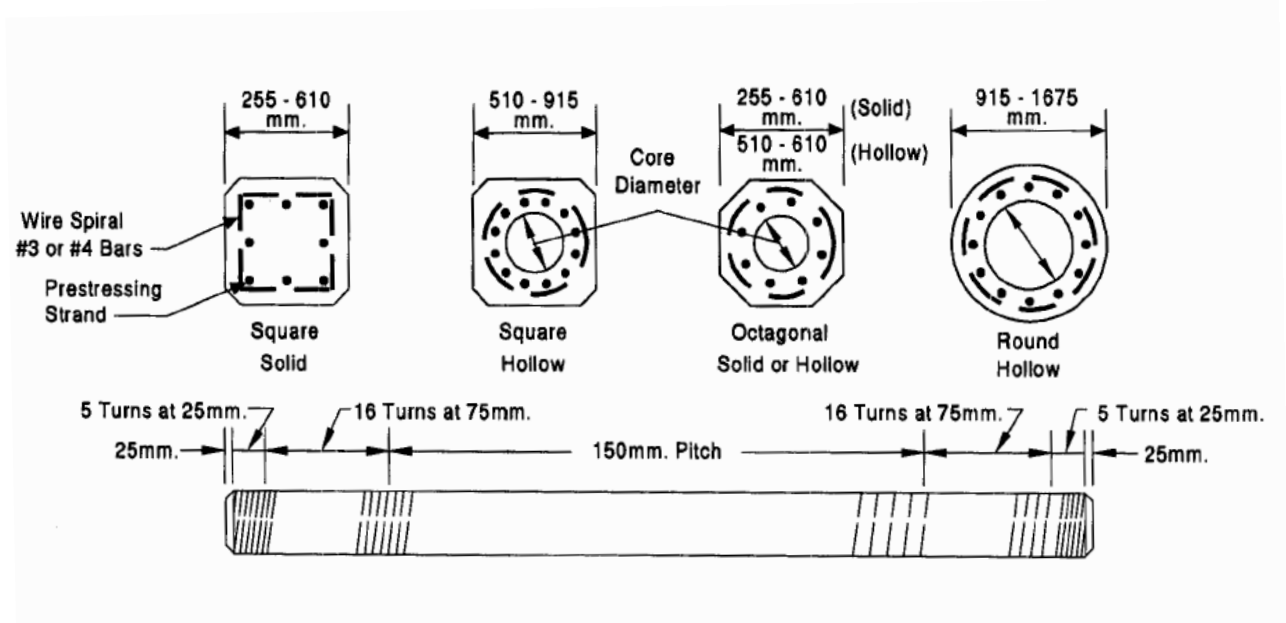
Typical pre-stressed concrete piles (after PCI, 1993)
